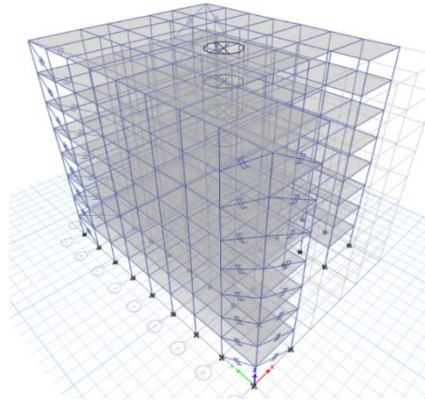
Building with Viscous Damper of different forces at corner bays of each story
